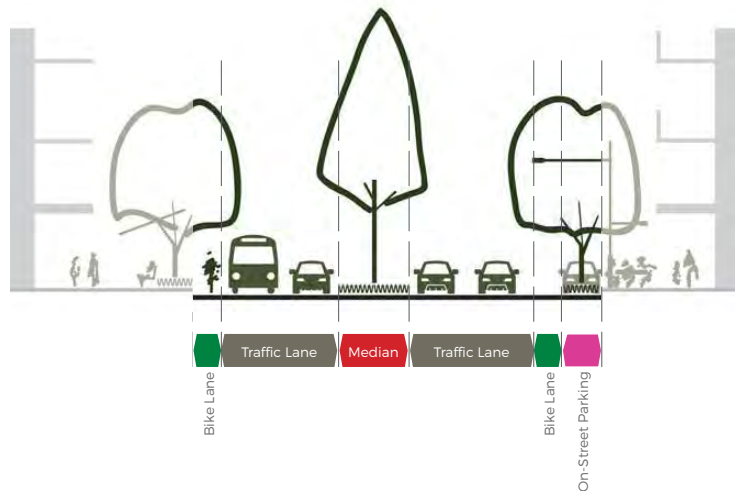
Streetscape Typical Cross Section for reference— CARRIAGEWAY
